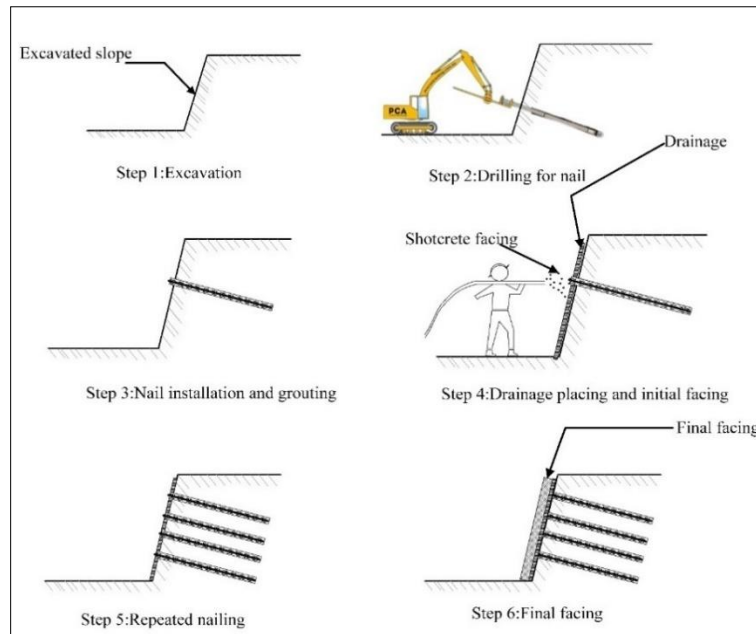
Soil nailing installation process (Byrne et al. 1998)
